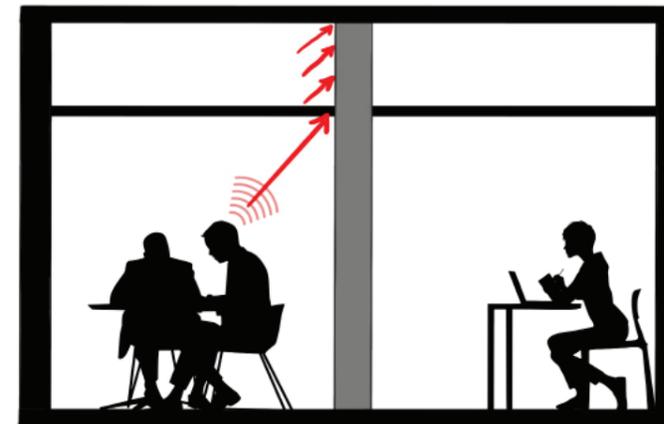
Section Showing All-the-Way-to-the-Deck-Walls
